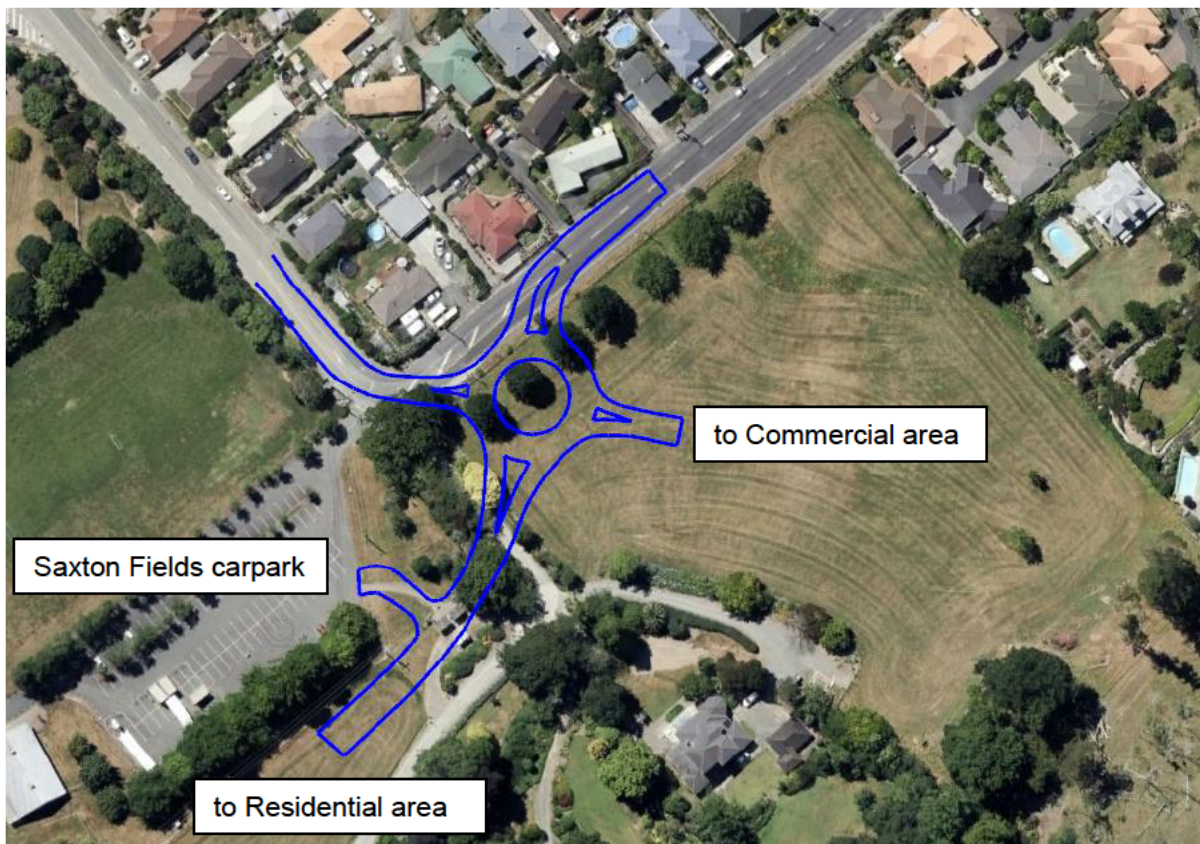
Concept for northeastern site access from Suffolk Road / Saxton Road
